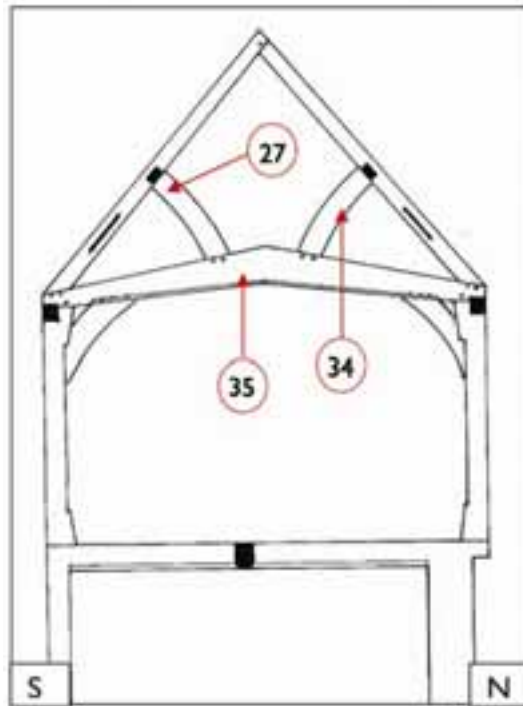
North cross-wing truss 7 showing sample locations, viewed from east looking west (based on drawings provided by N Hill)
